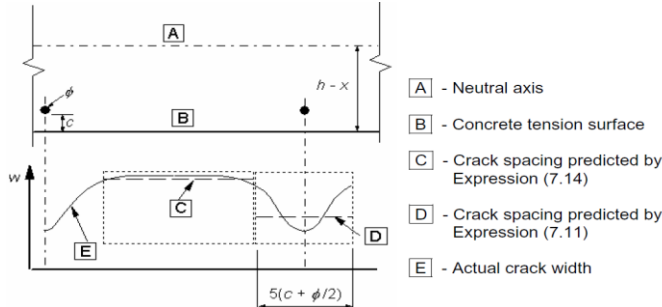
Crack width, w, at concrete surface relative to distance from bar [21]
